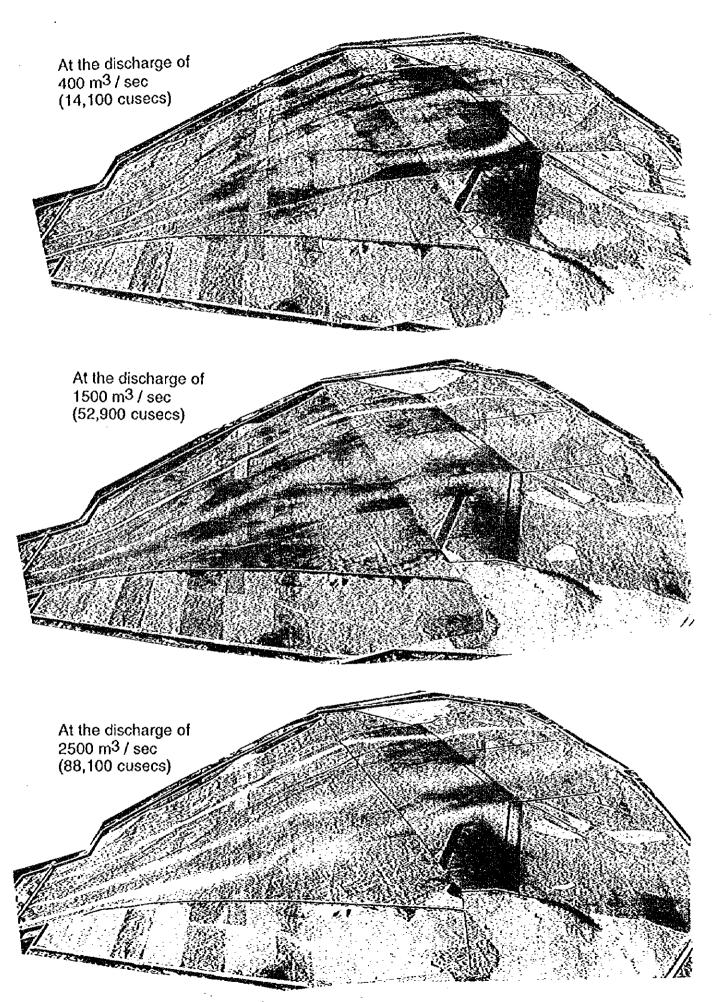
Bird's eye view of the stream during flooding (Case - 3; PLAN II)
